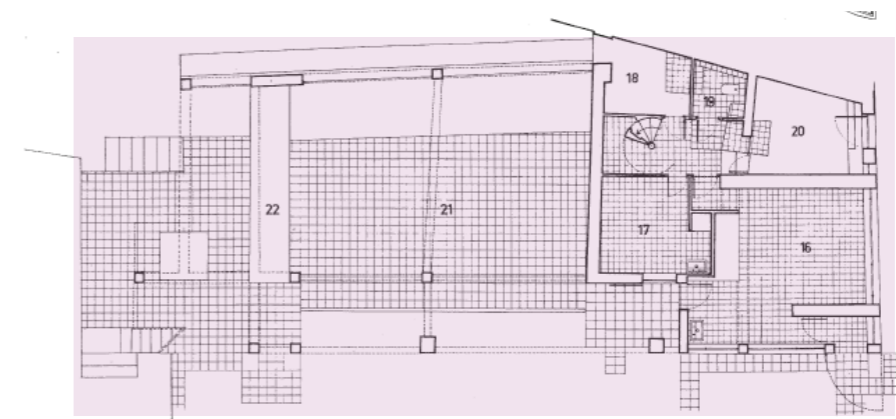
Floor plans, National Museum of Ireland. The stair to the 1st floor is also hidden, and the entire floor can be read as secret .
